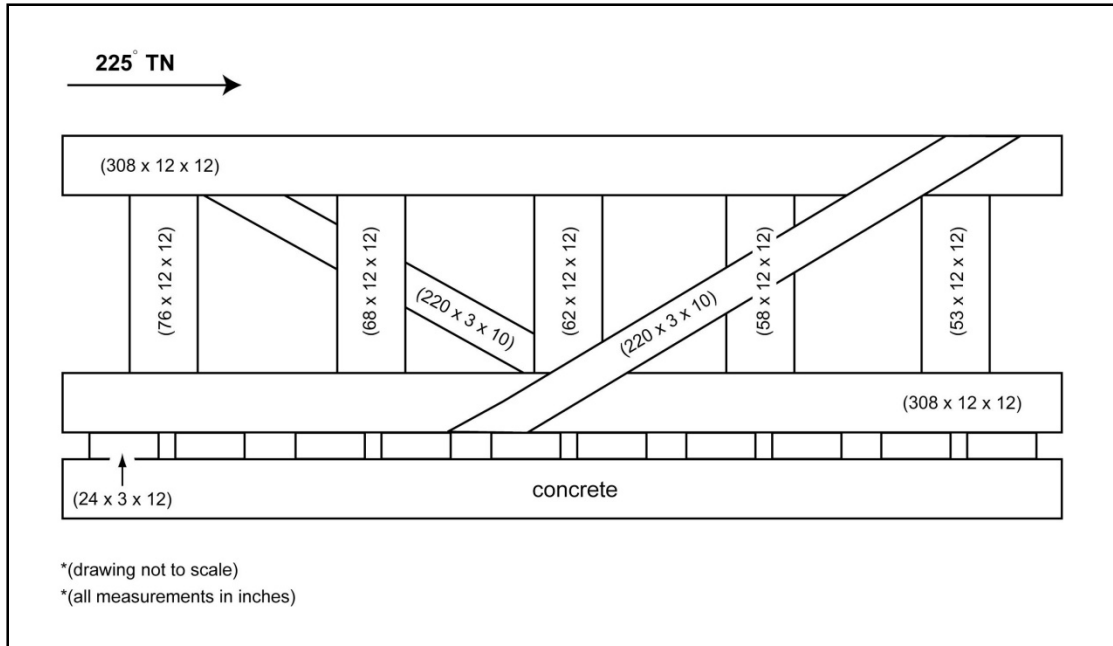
Schematic profile of SHIP # 50-80-07-6823, showing wooden column and bent supports, with wooden diagonal bracing, and the visible portion (concrete) of the bridge pier
